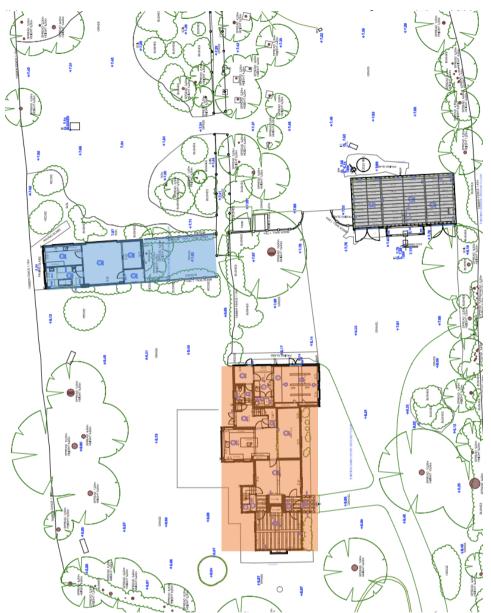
existing site plan. Orange = Farmhouse; Grey = modern garage & Blue = modern Annexe/ outbuilding, with brick walls.
